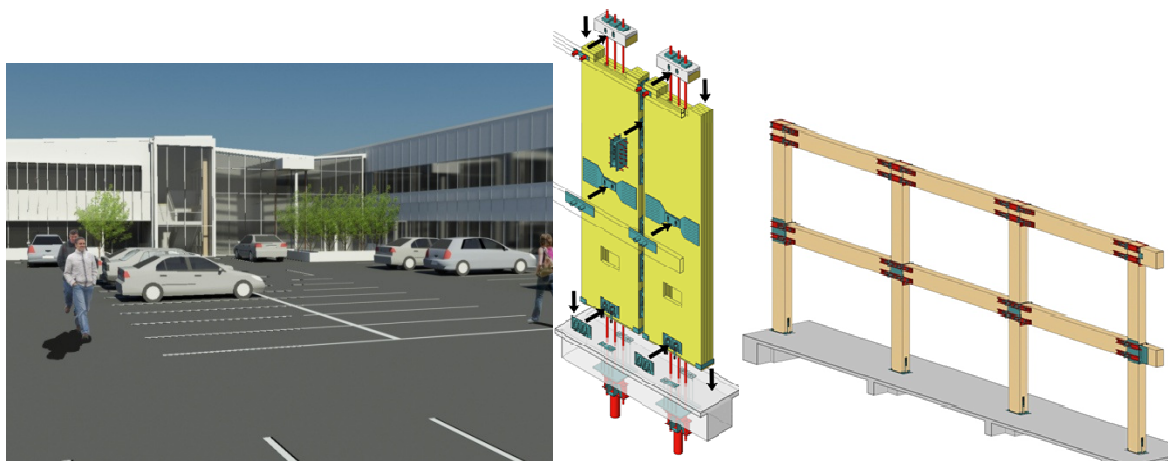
Christchurch Rebuild: Trimble Building, Architecture and Structures from Opus International (Brown et al., 2012)
